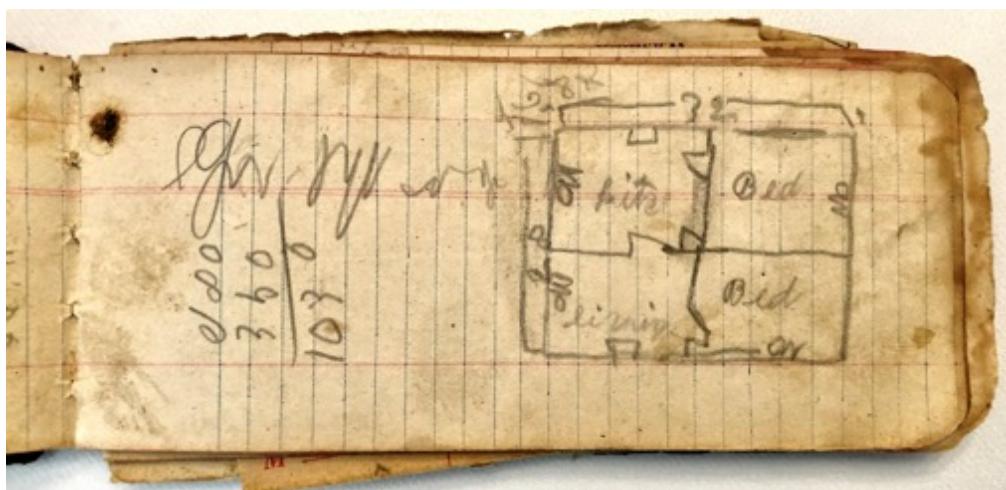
While John Henry's sketch does not exactly match the floorplan of the Carothers House, the arrangement of four similarly-sized rooms adjacent to one another resembles the home's interior arrangement. This sketch could also be in reference to one of the two other homes John Henry built in Franklin. Same small notebook pictured previously dated December 22, 1928, found in Carothers House October 2019.
